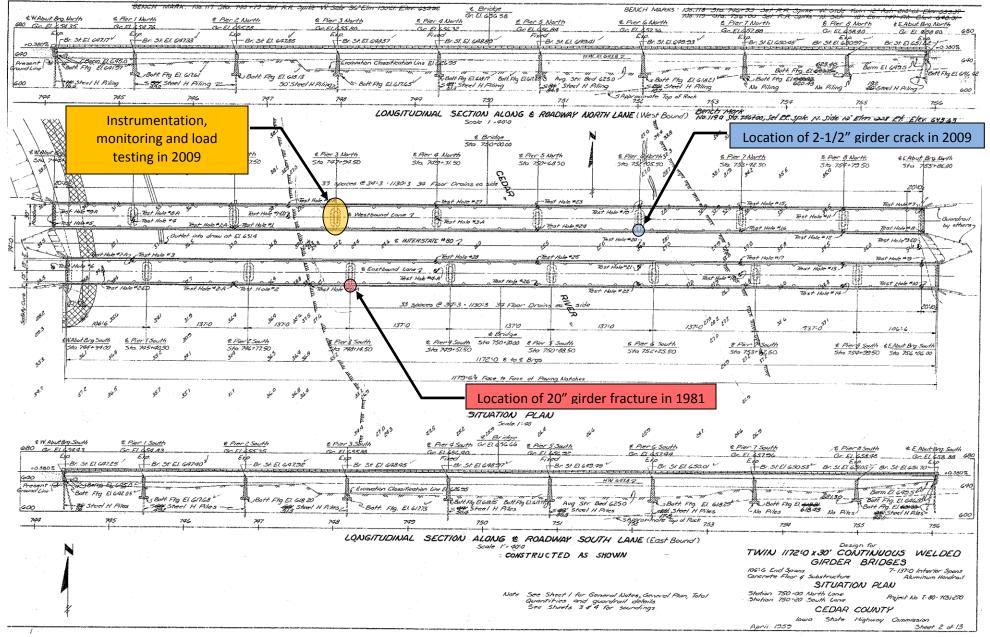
Situation Plan of twin bridges on the I-80 Bridge over the Cedar River.
